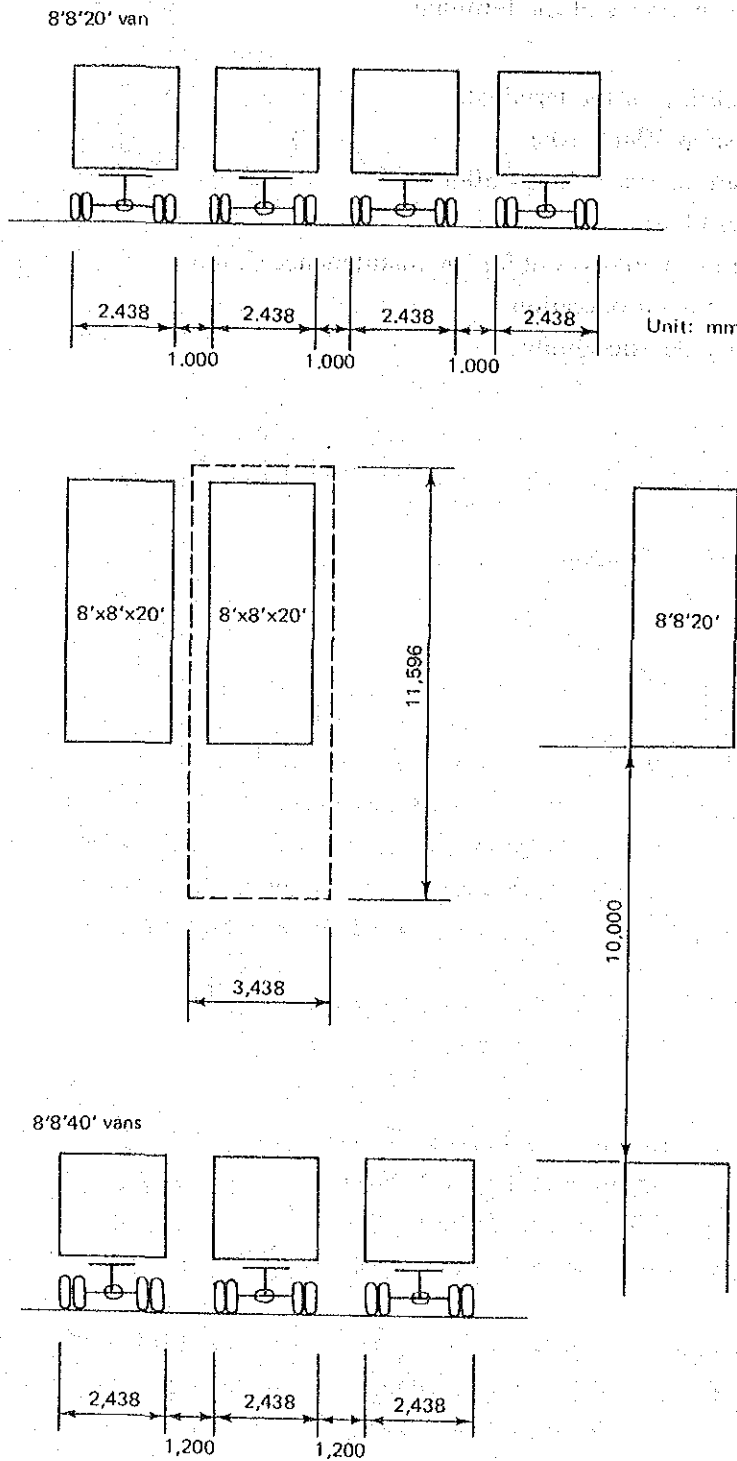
(c) Layout of container yard (Transtainer system)
